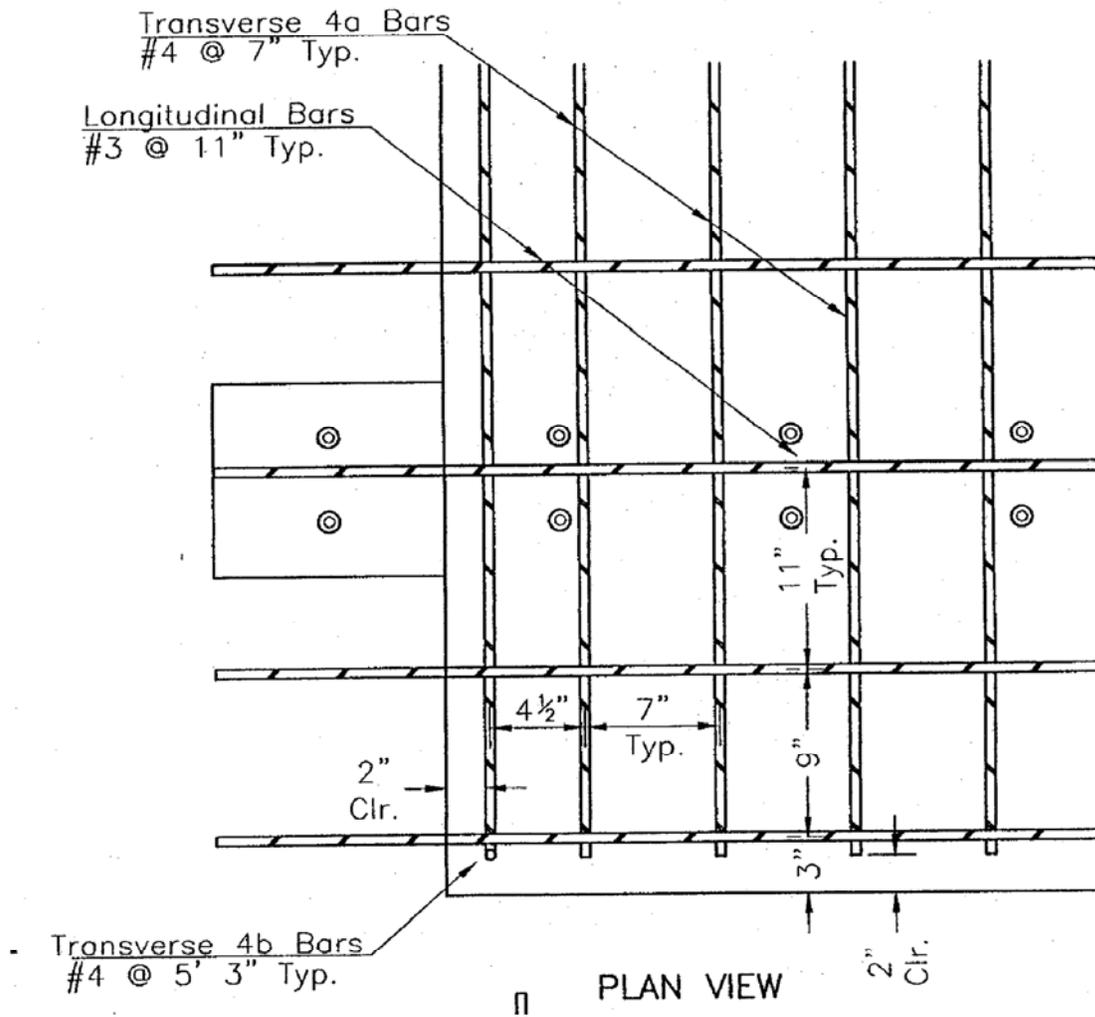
Black Hawk County modified reinforcement spacing at PCDT ends.
